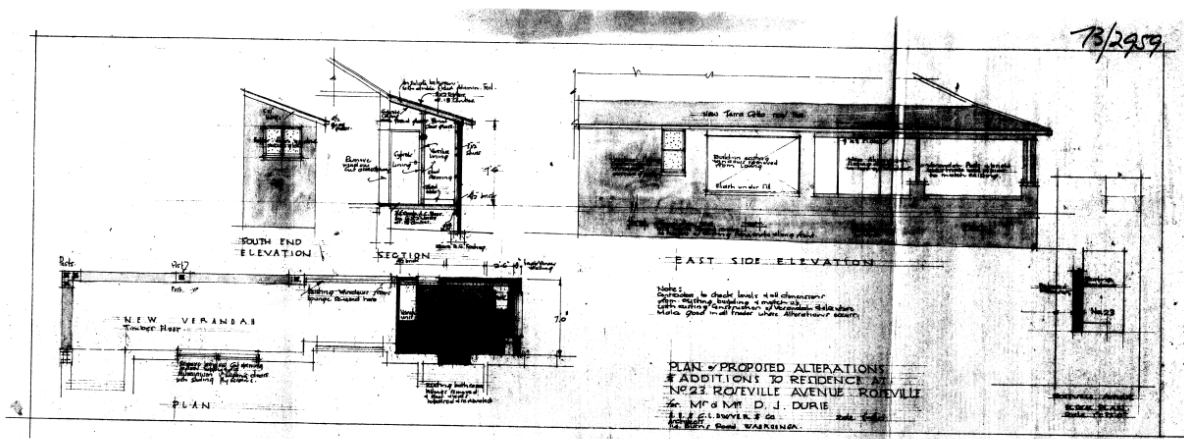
Plans and elevations detailing extension of veranda dating from 1973
